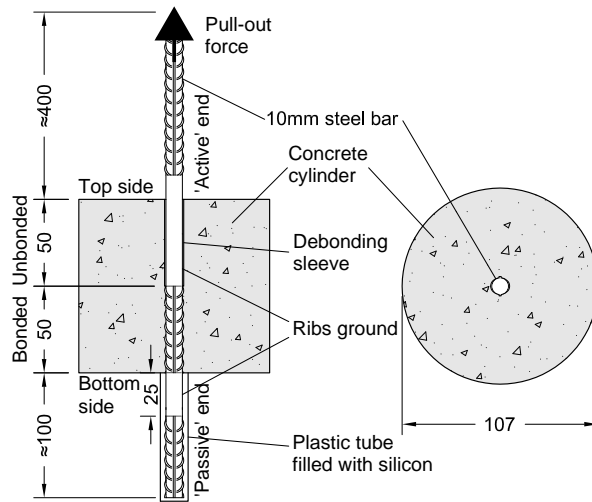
Specimen geometry: section along the longitudinal axis and transverse cross section through the concrete cylinder
